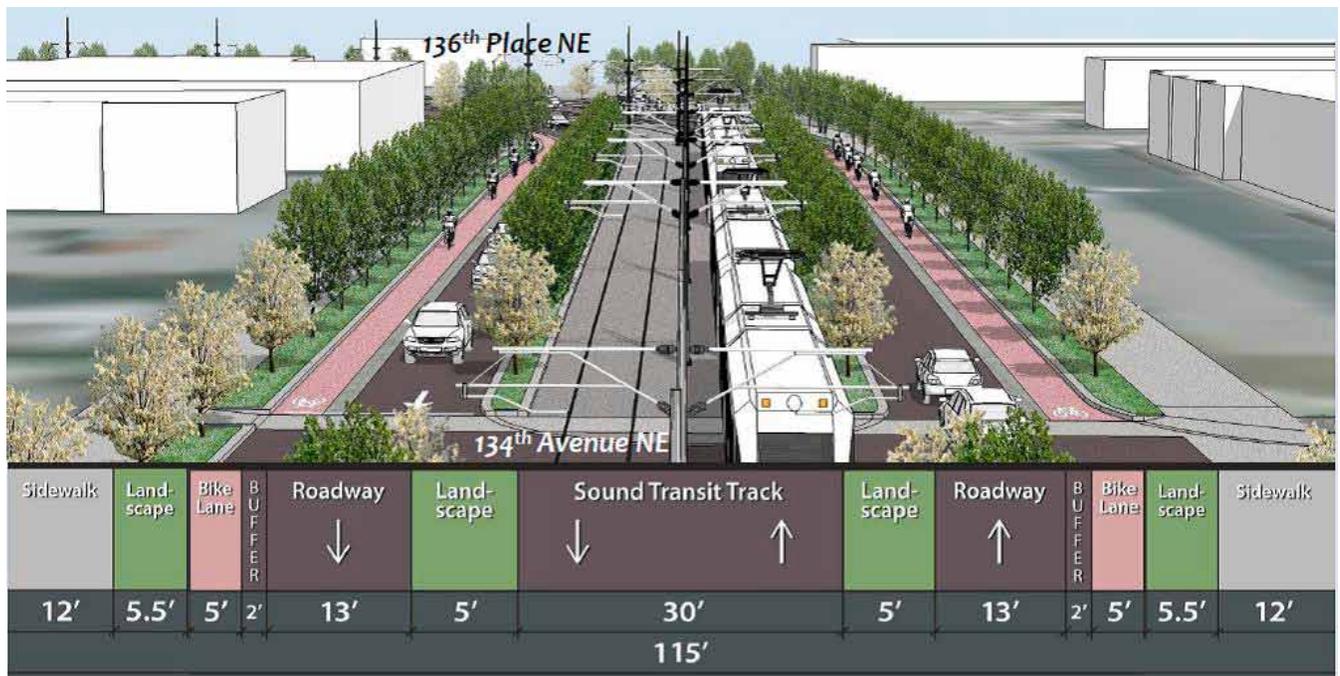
NE 16th Street Section at 134th Avenue NE
